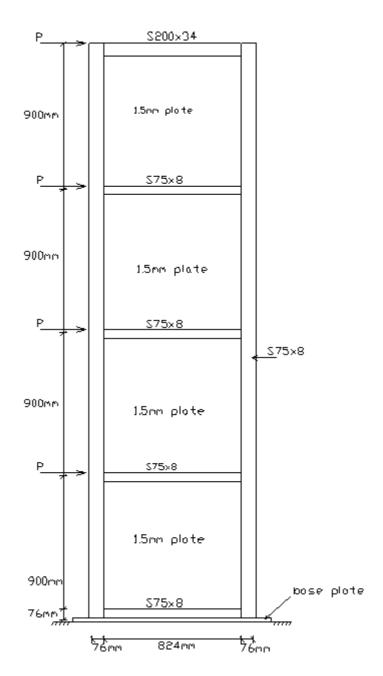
Details of Specimen Tested by Lubell et al. (2000)
